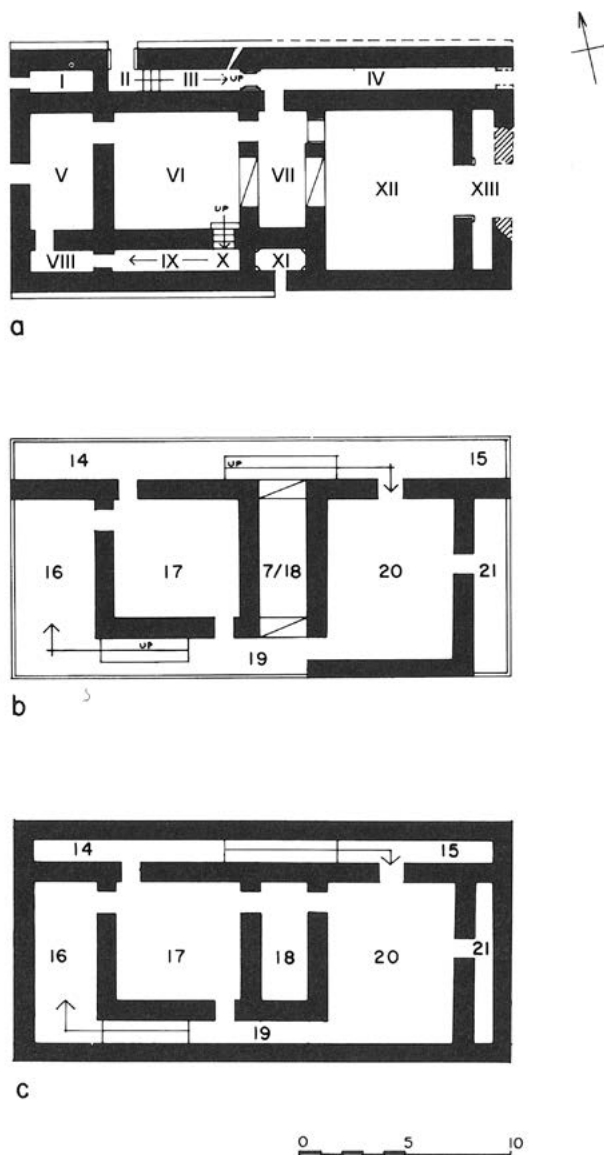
THE HOUSE OF THE TILES AT LERNA. GROUND FLOOR (A) AND SUGGESTED RECONSTRUCTIONS OF THE SECOND STOREY (AFTER SHAW 1987: 62 FIG. 3).
